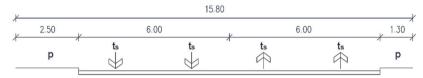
Geometrical cross-section of Boris Kragjer - East [source: Author]
